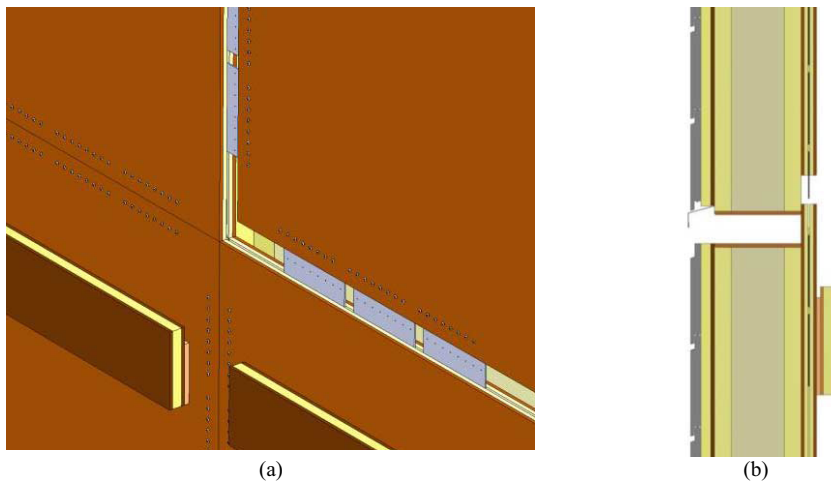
The MFB floor element with PlyBoard™ panel and I-beams.
